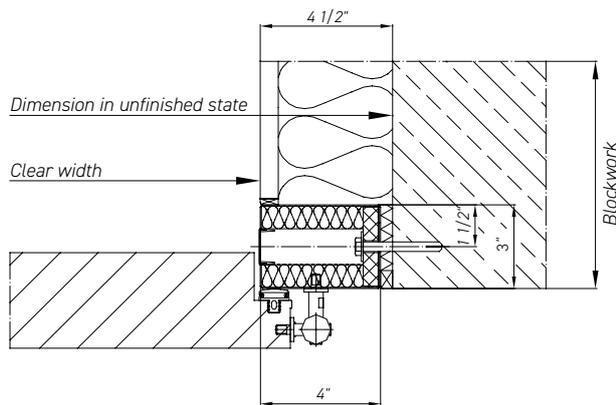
Block / Block frame with pocket holes in the reveal area
